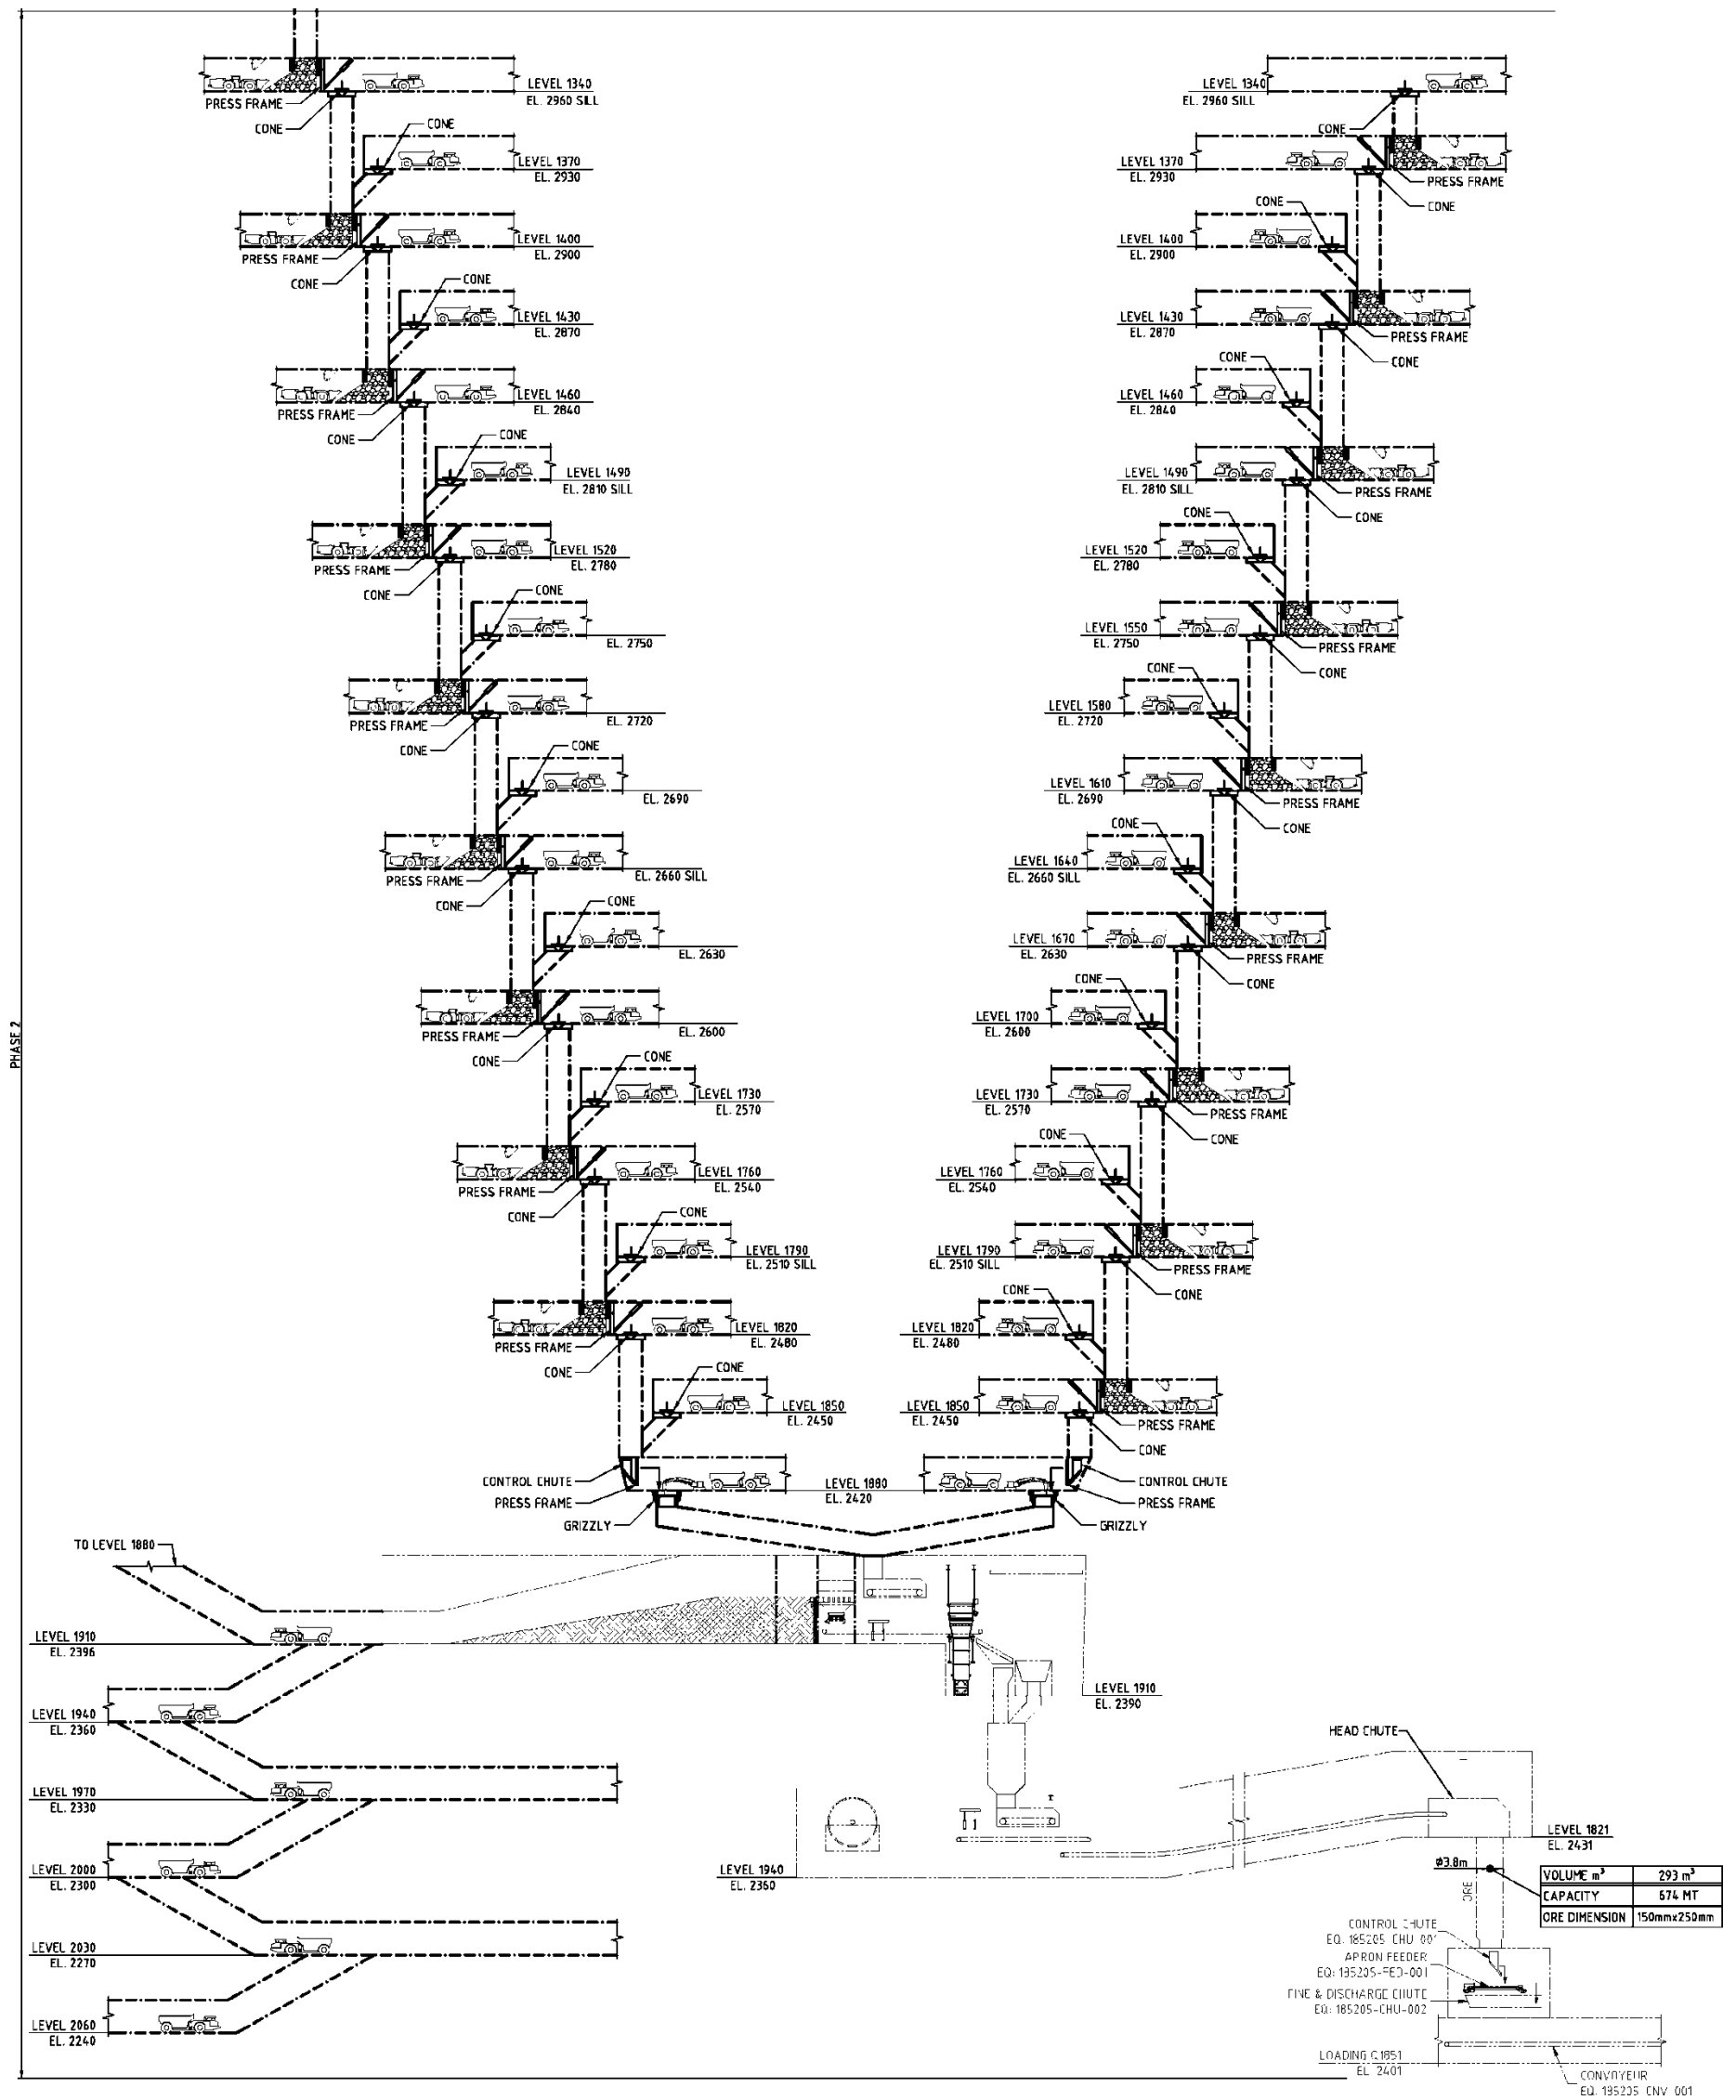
Underground infrastructure diagram – Phase 2 ore handling
